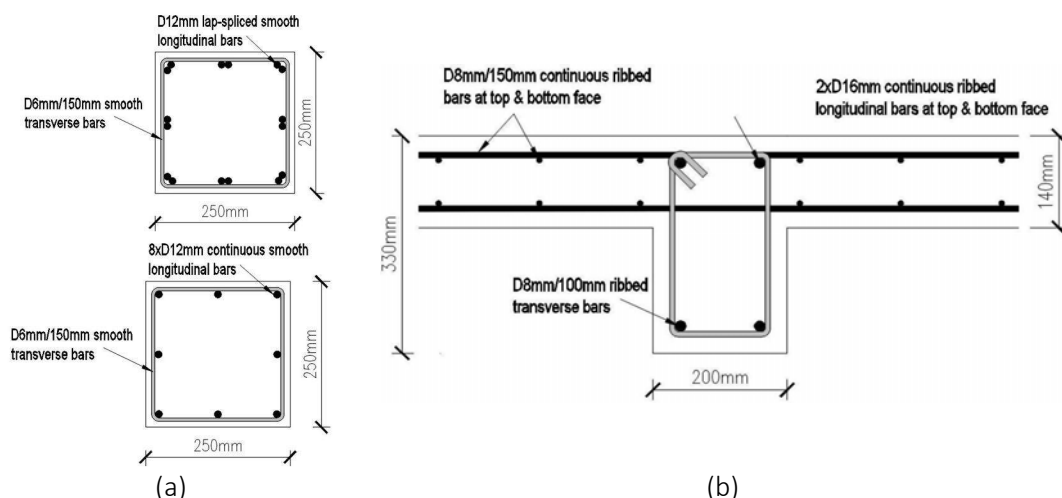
Layout of bars in the cross-section of (a) columns, in lap-splice region and outside; (b) beams
